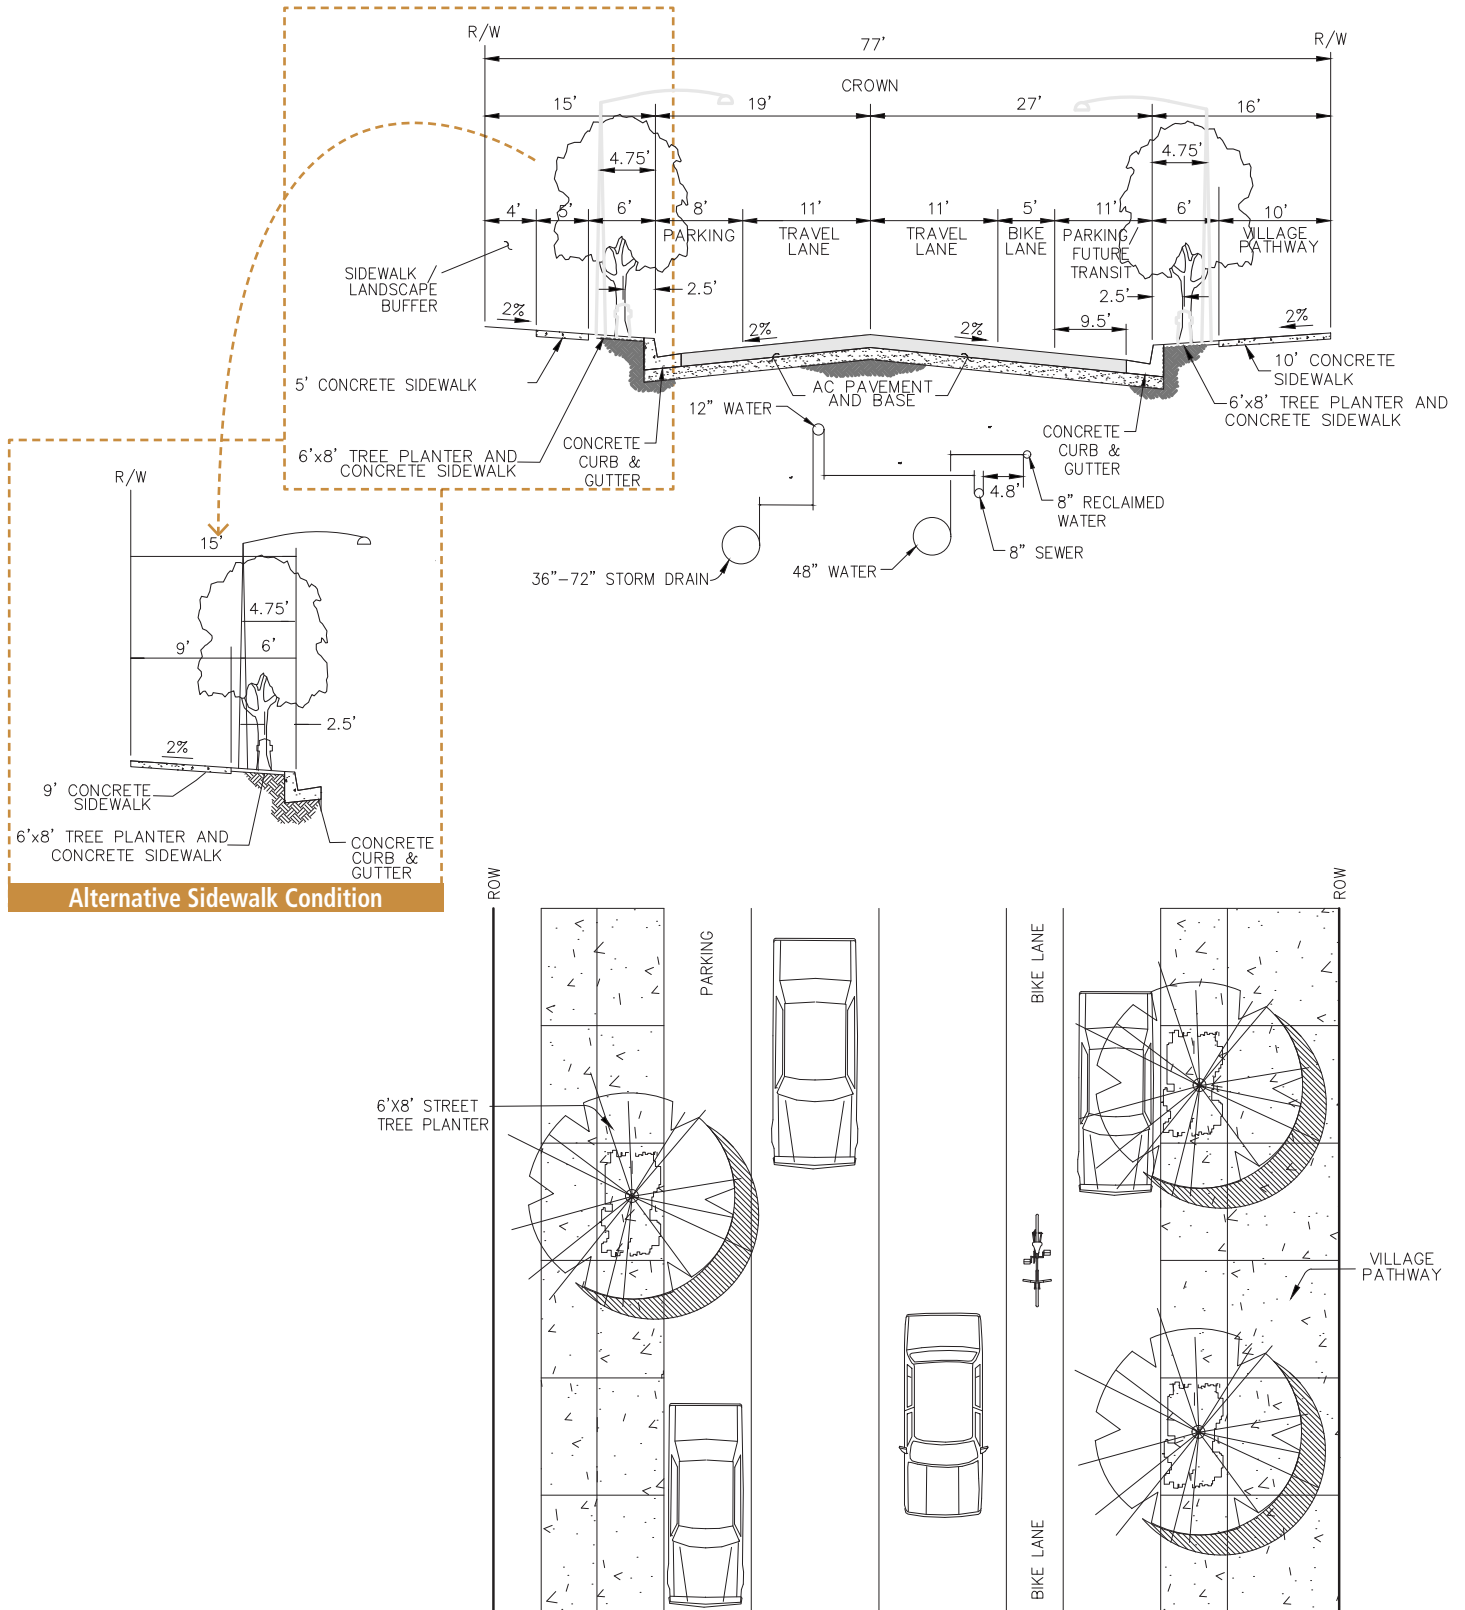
Westbound Main Street (TM Street Section 4)
